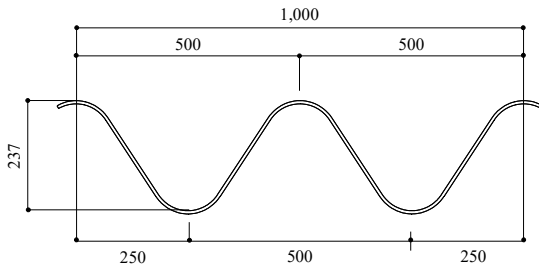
Cross-section and dimensions of EXDEC (Unit: mm)
